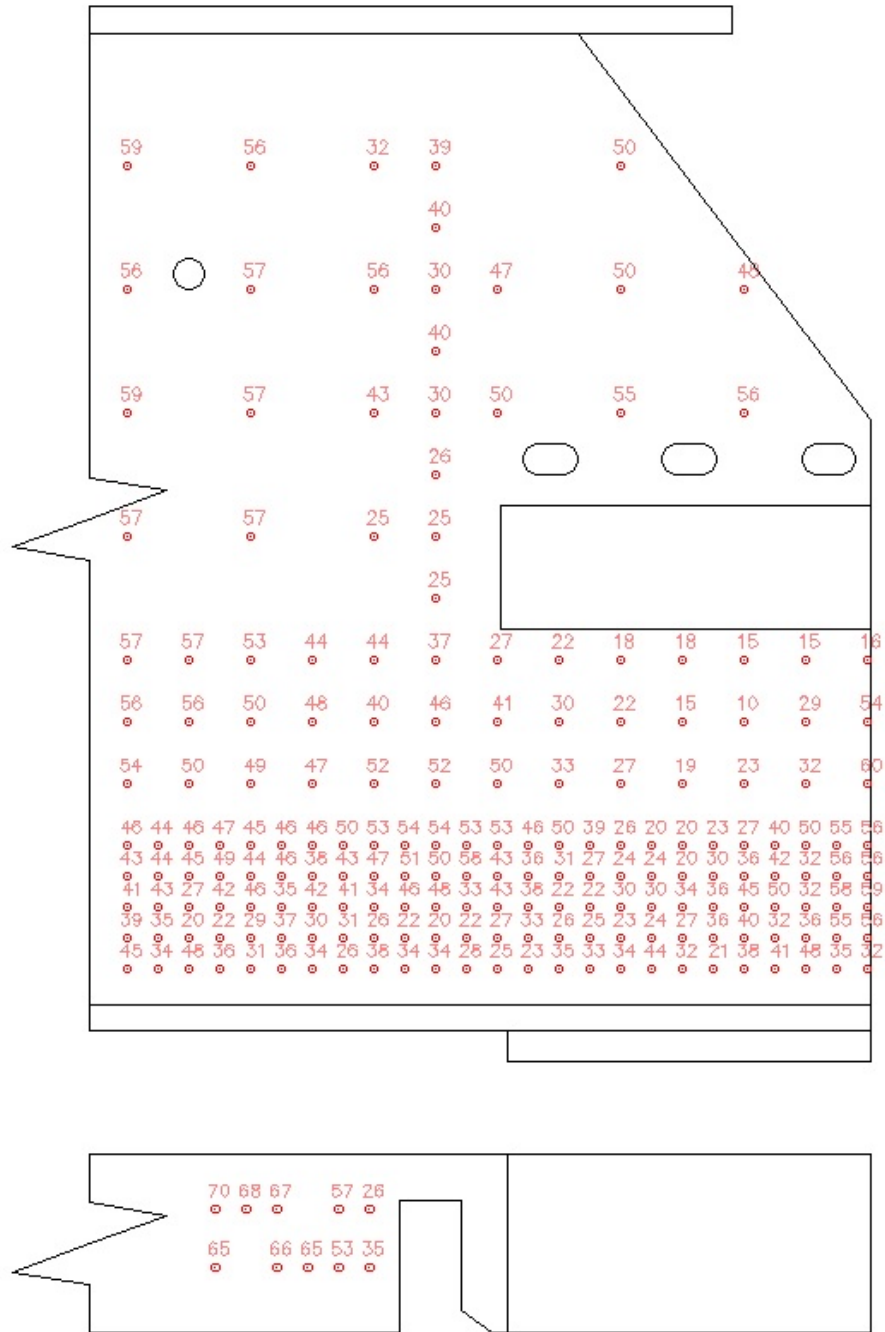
Measurement of web and flange thicknesses, Specimen 2.
